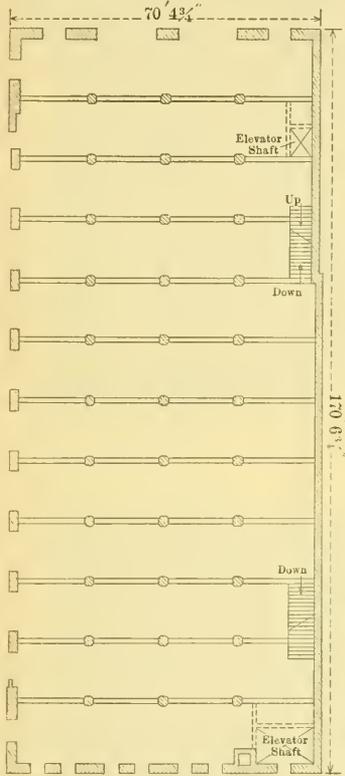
CONCRETING ON FIRST FLOOR, WATSON BUILDING.
